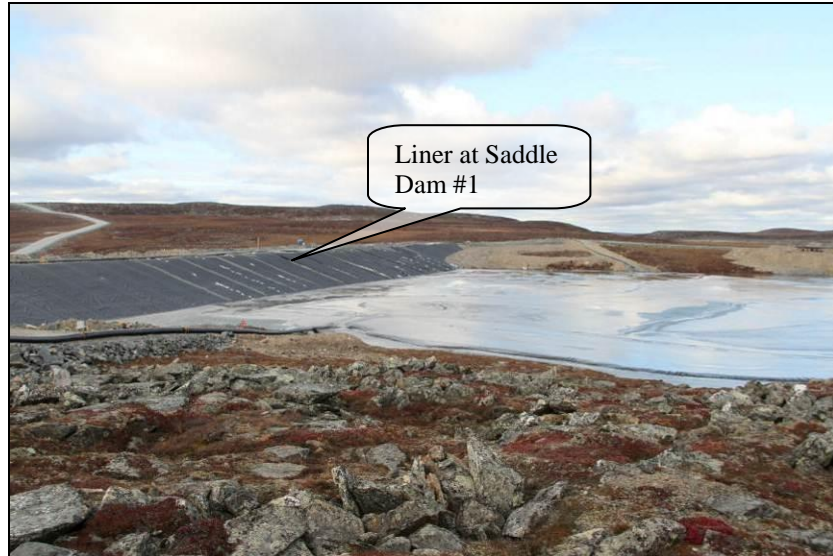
“Beach” tailings with Saddle Dam #1 in the background
